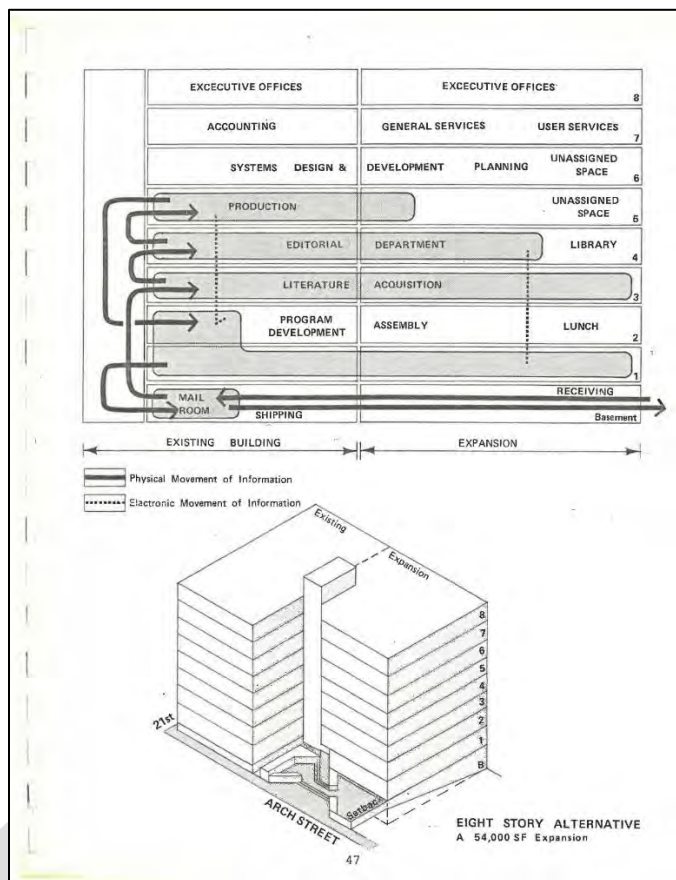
WRT Plan for the proposed eight-story addition to 2100 Arch Street. (Source: *Projections and Requirement for Future Expansion*, 8.)
